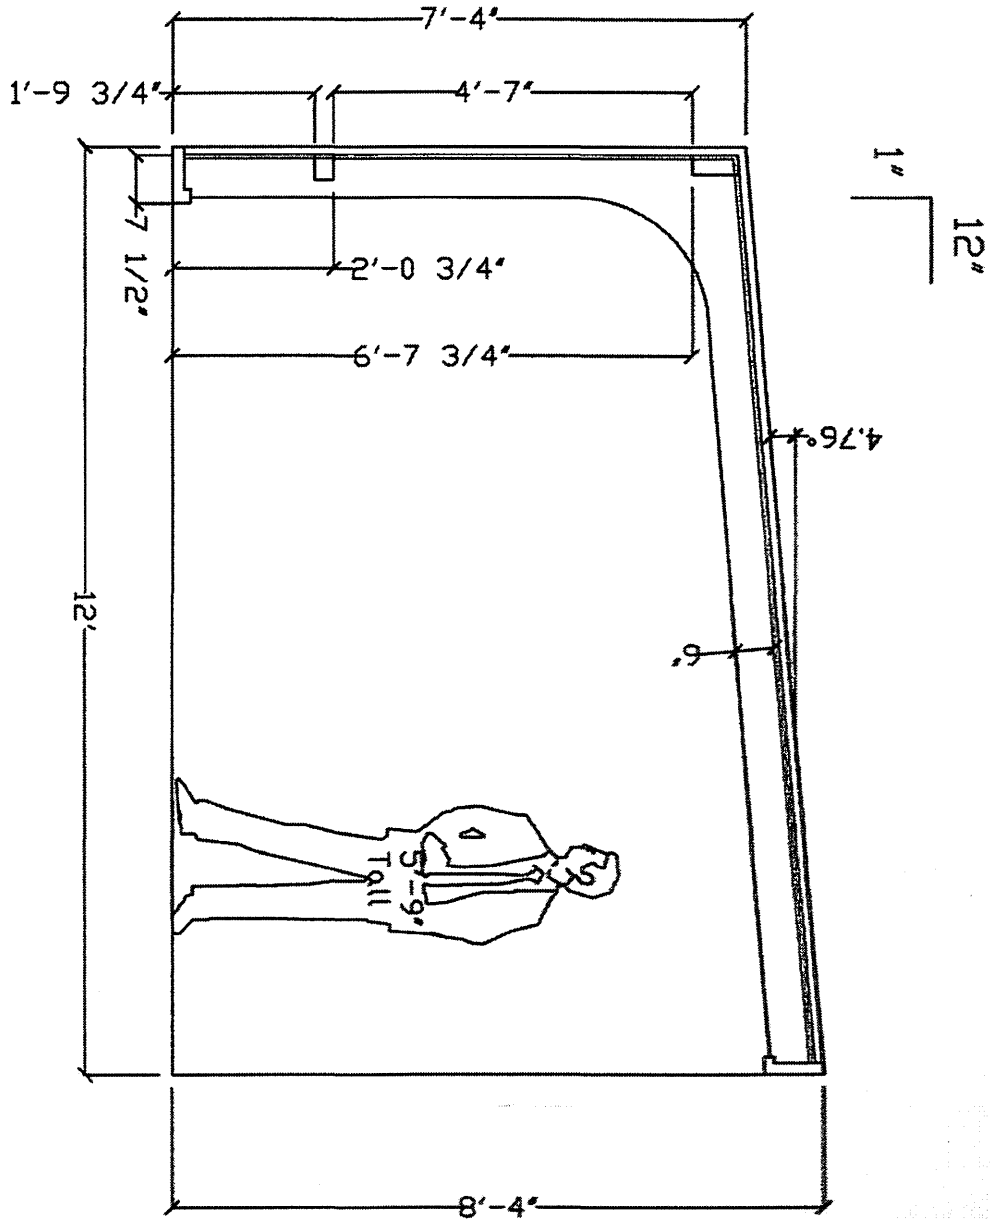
of 11	5-2-19	Preliminary Drawing
